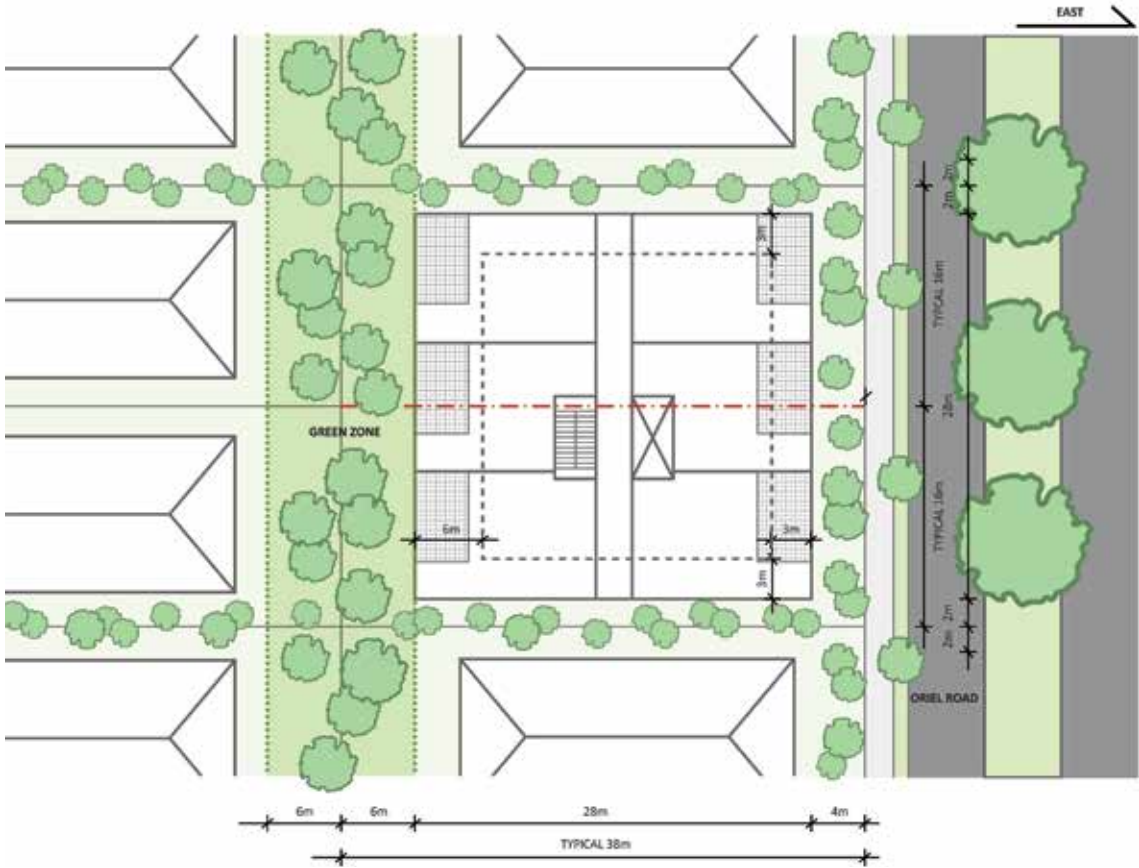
Typical Upper Floor Plan - Main Roads with two lots consolidated
